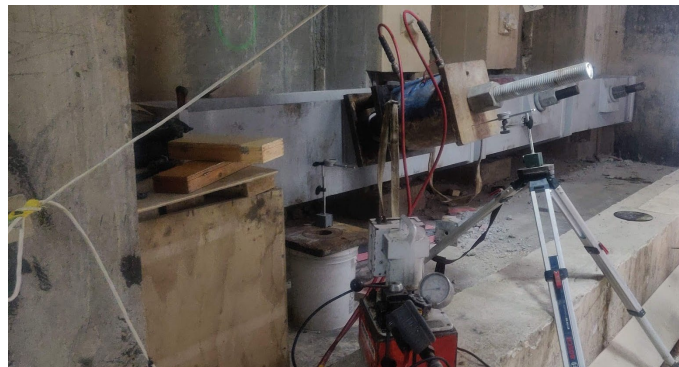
Construction photos showing a new ground anchor's acceptance test in progress
